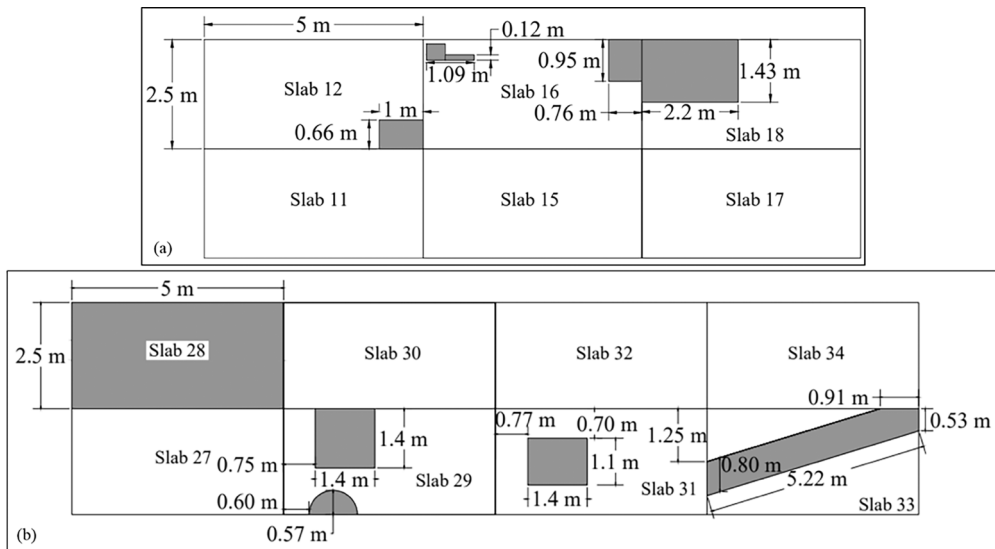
Schematic of the pervious concrete pavement slabs with sealed surface.
